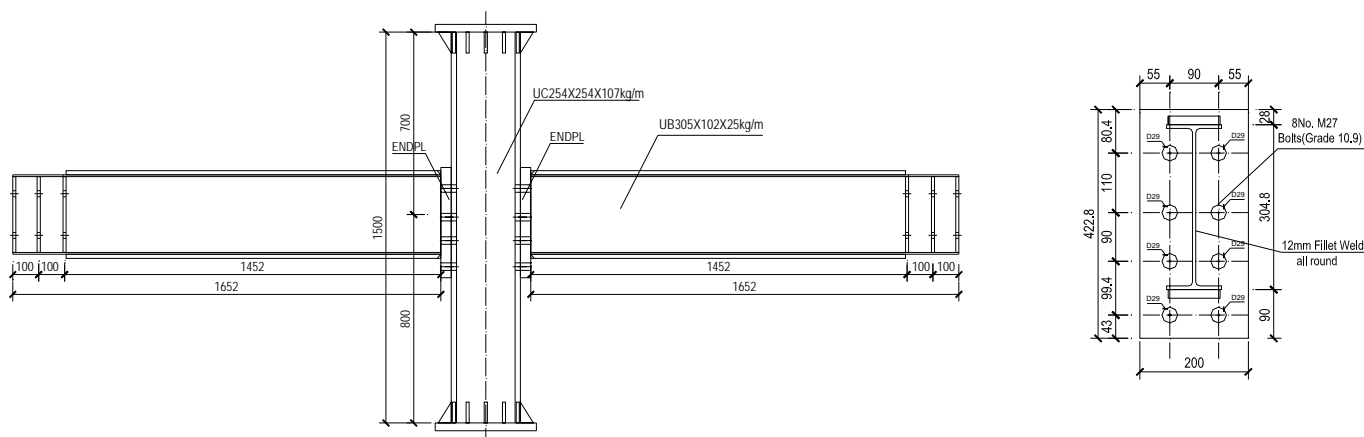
Bare Steel Extended End-Plate Joint Detail (CR4, CR5 and CR6)
